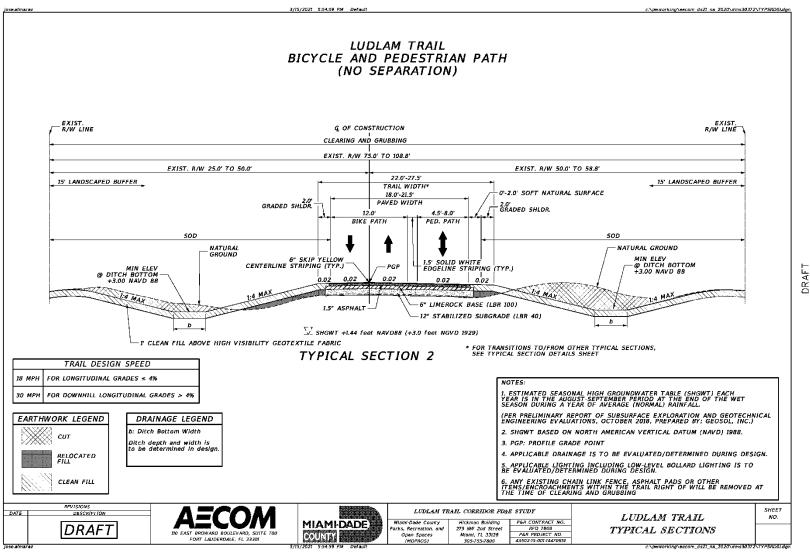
2: Proposed Typical Cross Section for the Ludlam Trail Bicycle and Pedestrian Path (No Separation)
